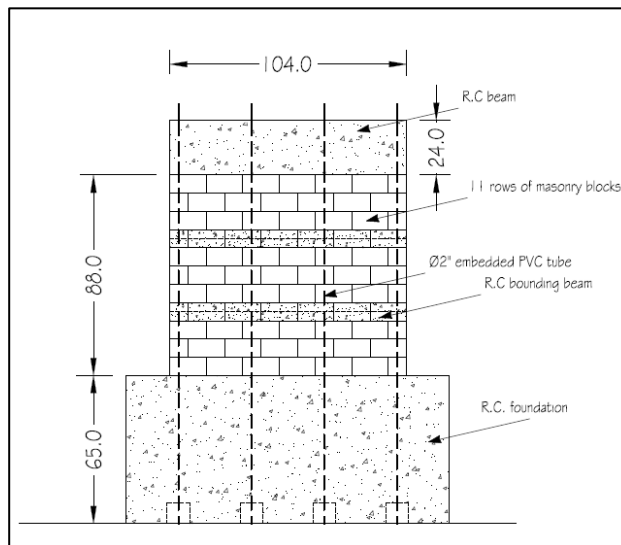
Post-tensioned wall with 32 inch spacing and two bond beams
